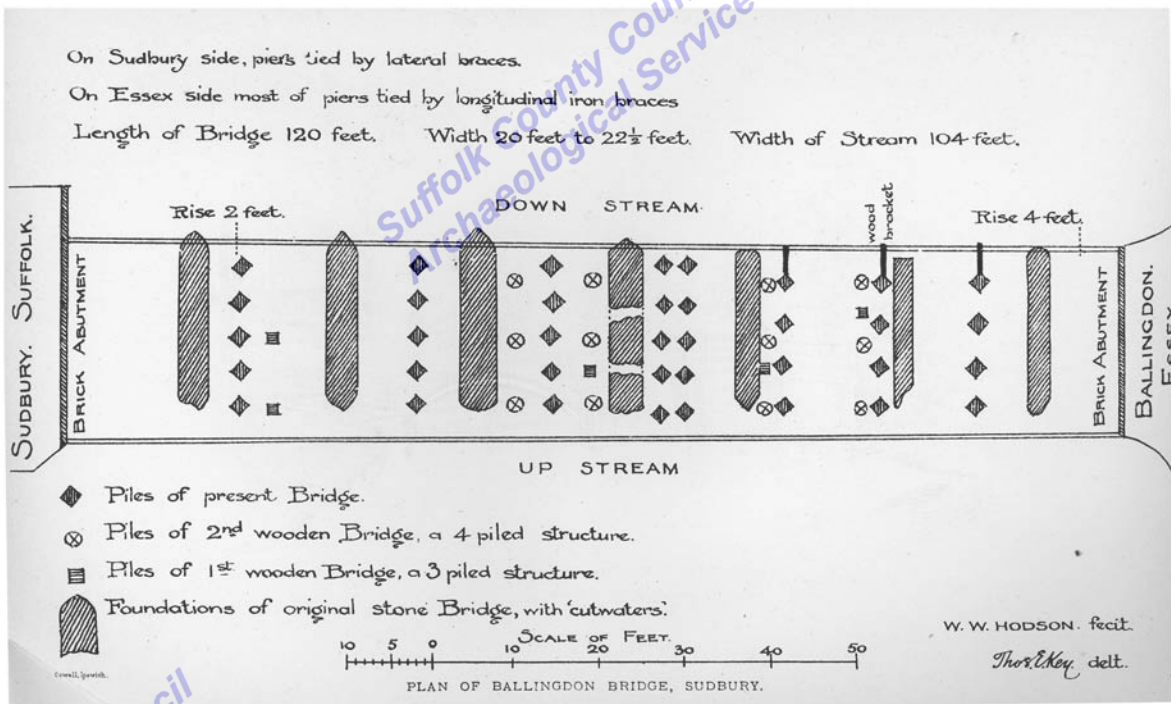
Bridge illustration and Hodson's plan of Ballingdon Bridge published in PSIA 1892
